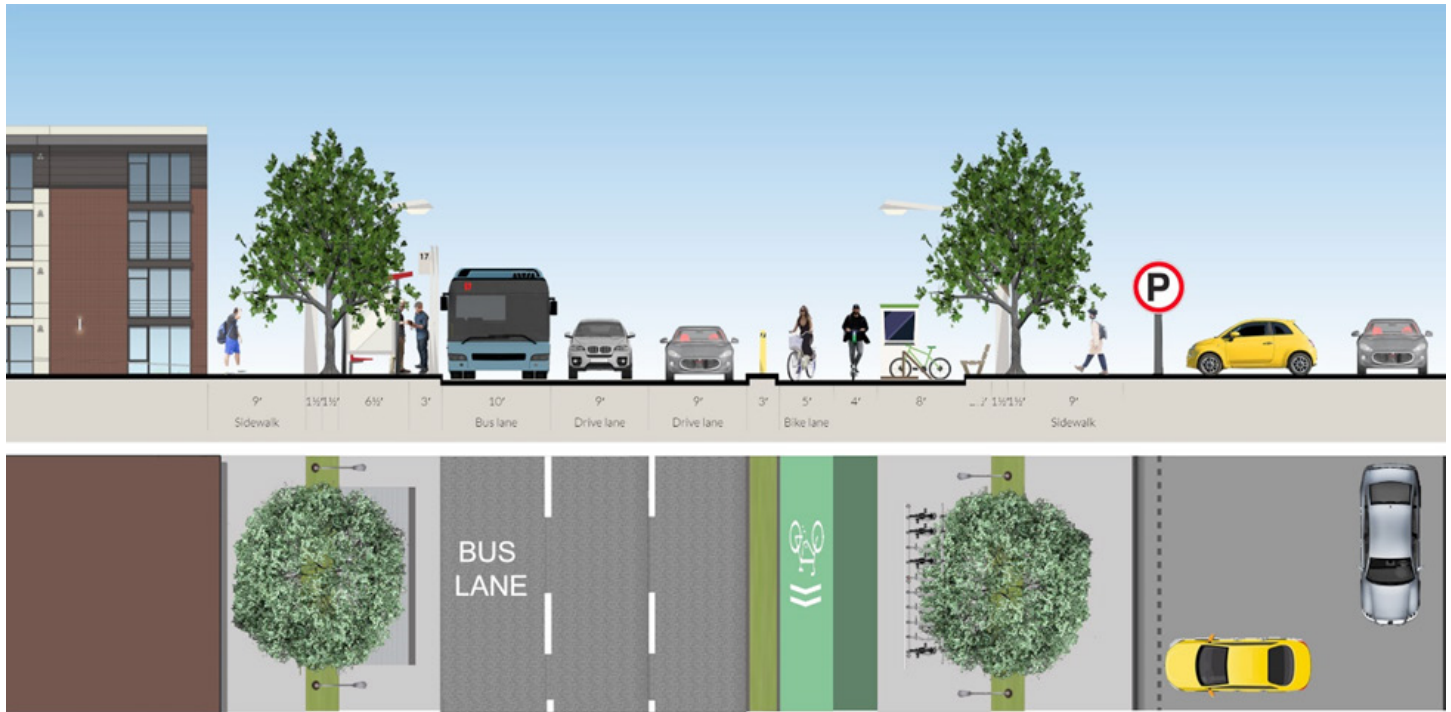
Dolorosa Street proposed right-of-way (plan and section)
